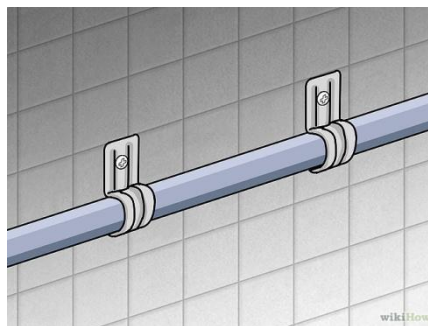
Conduit wiring [Ref: www.google.com]
